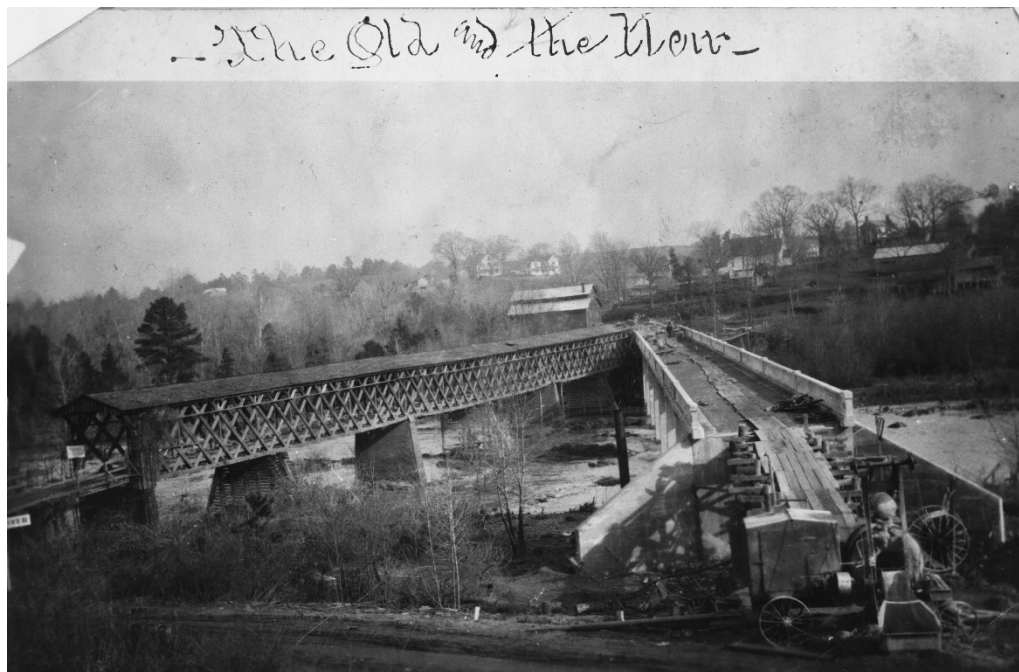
c. 1922 photo showing new bridge nearing completion, and the old bridge to its north.
